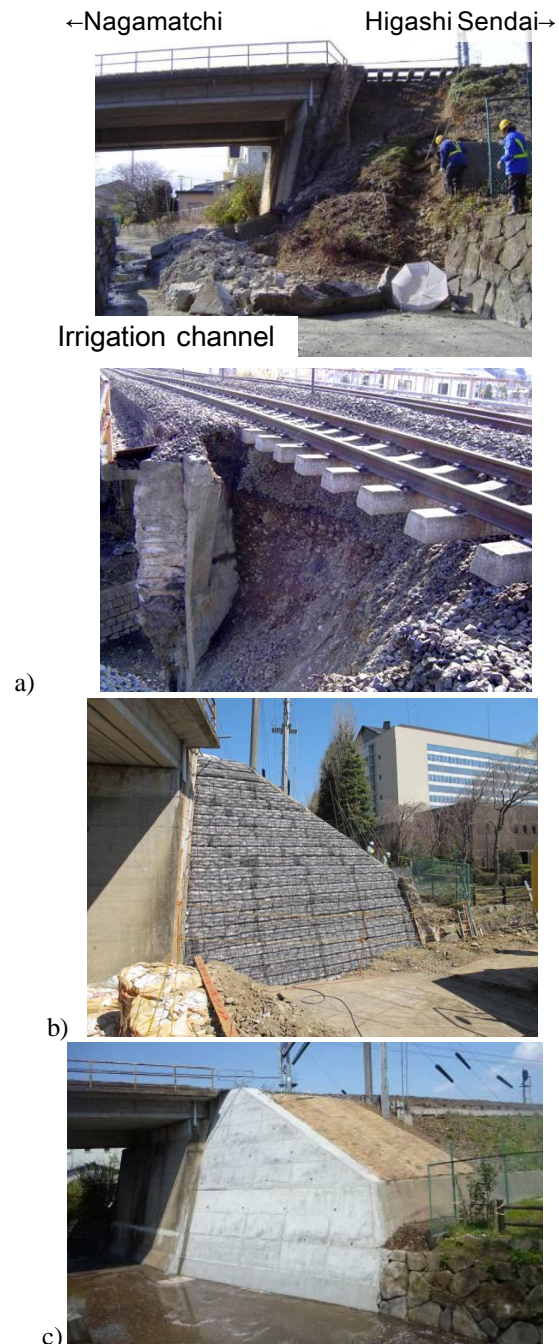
a) Collapse of a wing RW (with a masonry facing of a bridge abutment) at site No. 11 in Fig. 8 (Nagamachi, Sendai for Tohoku Freight line); and b) & c) its reconstruction to a GRS RW (by the courtesy of the East Japan Railway Co.).
